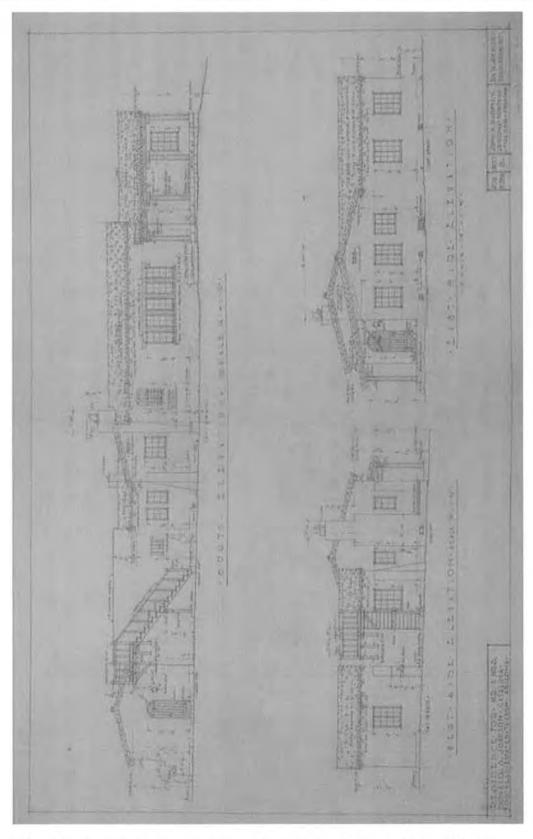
Joesler Elevation Drawing (Johnson House) 1931, Arizona Architectural Archive
